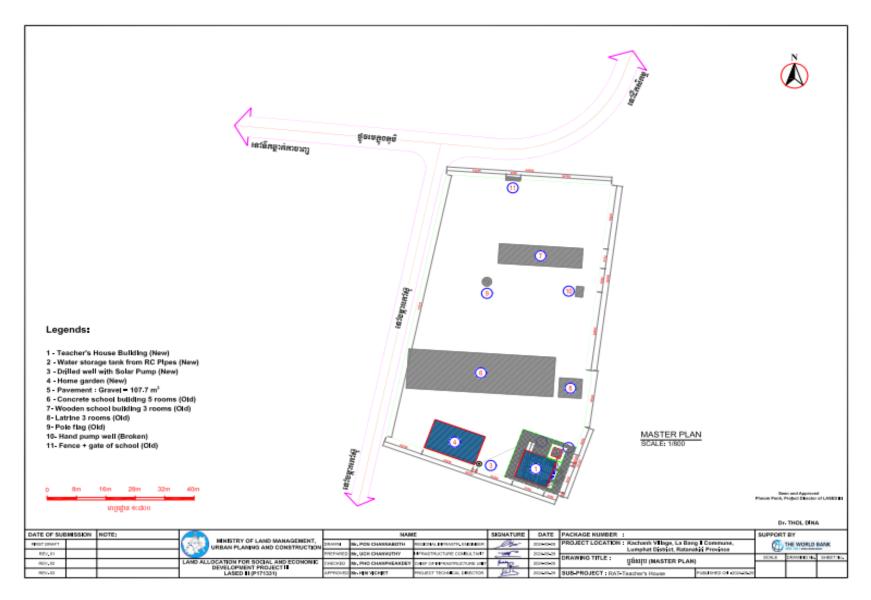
Master Plan of Teacher's House Building in Kachanh Community/Village
